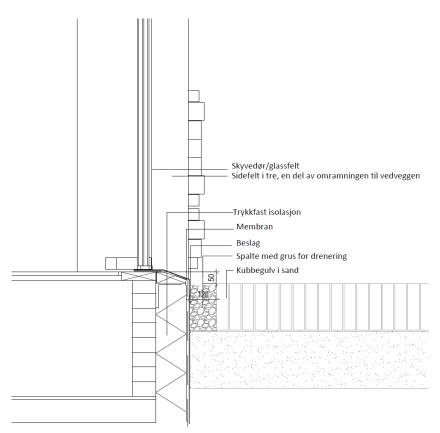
The transition from the wall and floor elements to the ground in the atrium. Source: Snøhetta.
